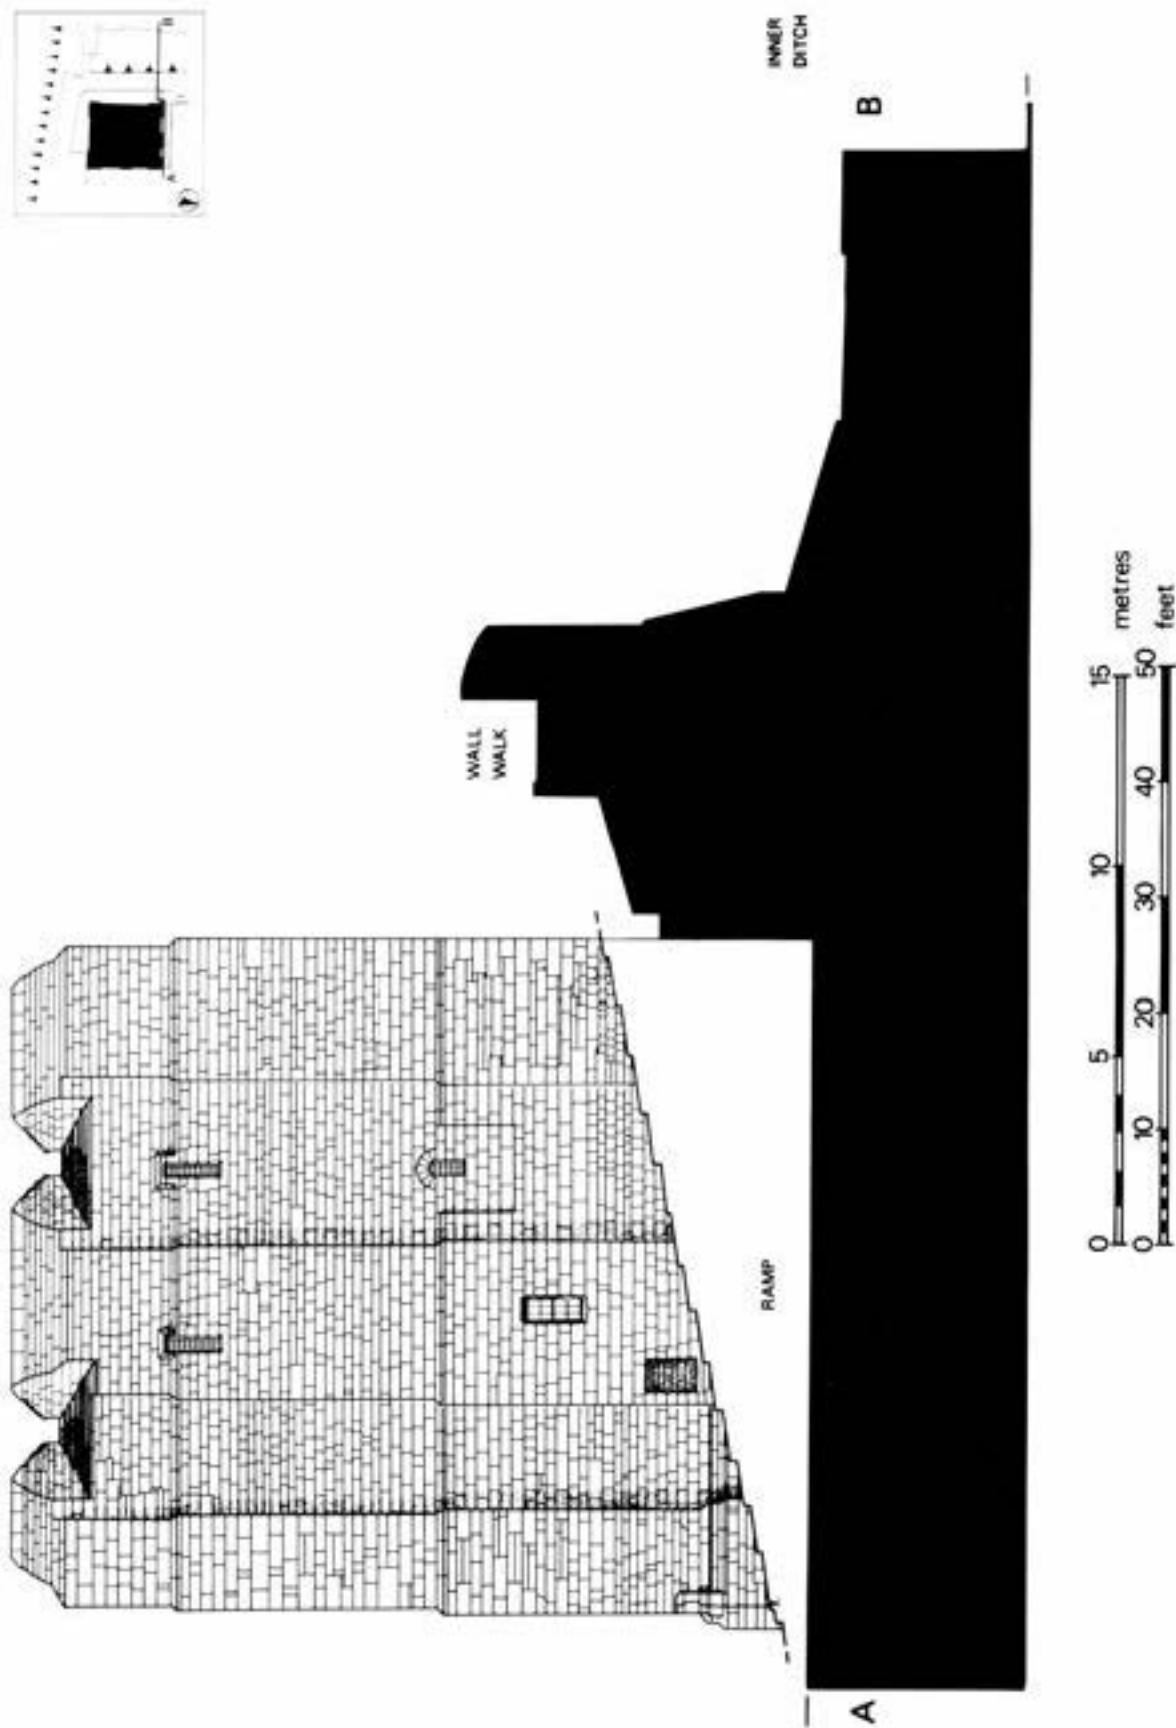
The keep, external elevation of the north wall showing the relationship with the west curtain wall of the inner ward
